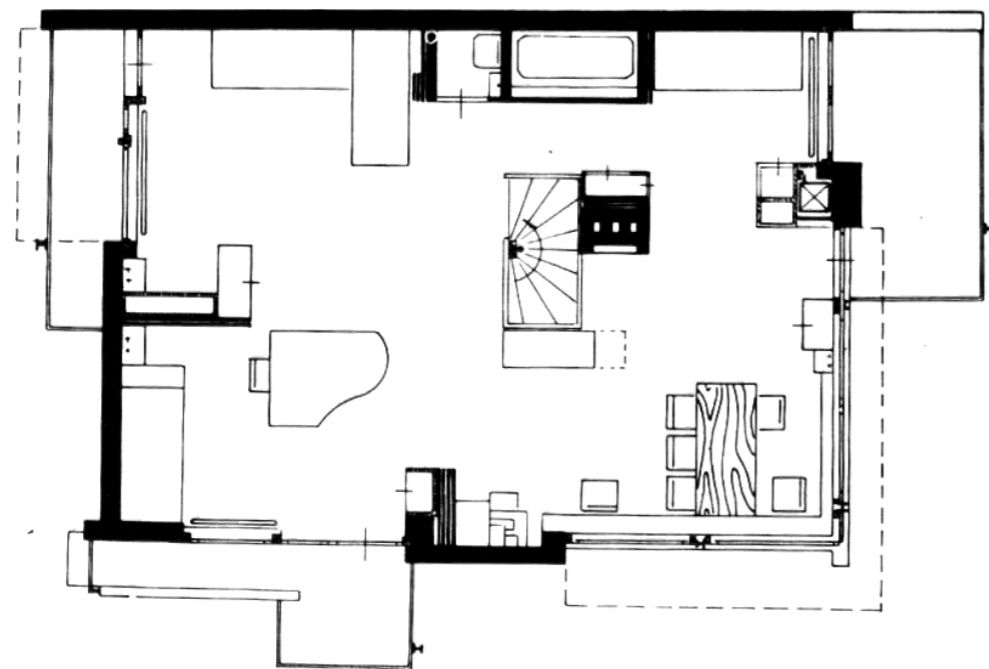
Schröder Huis ground floor plan (Gerrit Rietveld, 1925)
